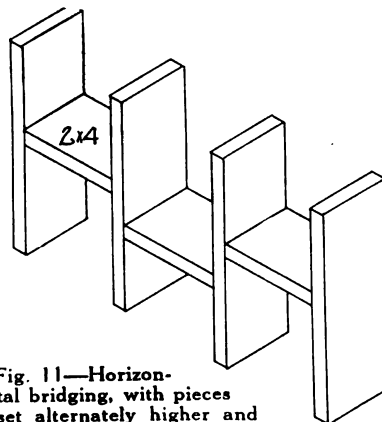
Horizontal bridging, with pieces set alternately higher and lower.
